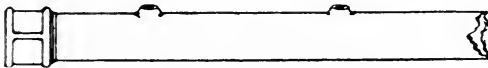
Cast pipe with bosses to receive wrought branch connections.
